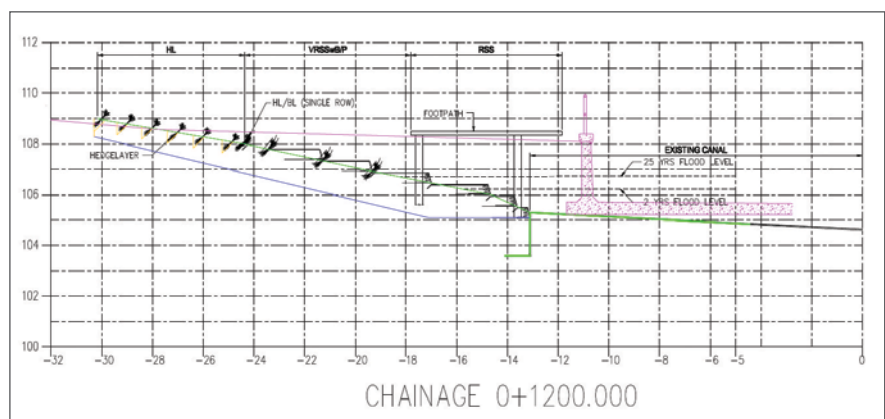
Typical cross-section of geogrid-reinforced soil bio-engineered slope.
